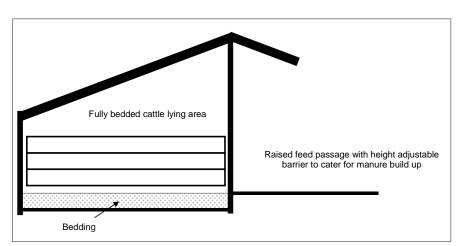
Straw bedded facility cross-section showing raised passageway
